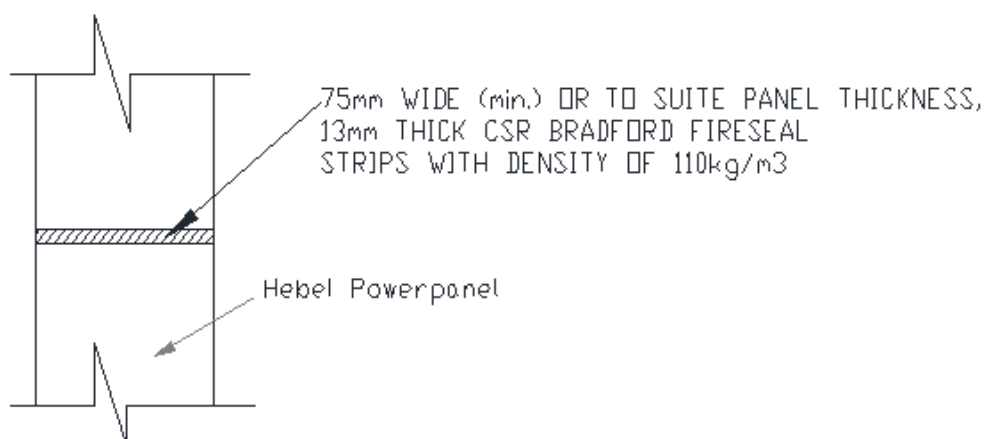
Horizontal joint Type 3 – 75 mm Hebel AAC panel
